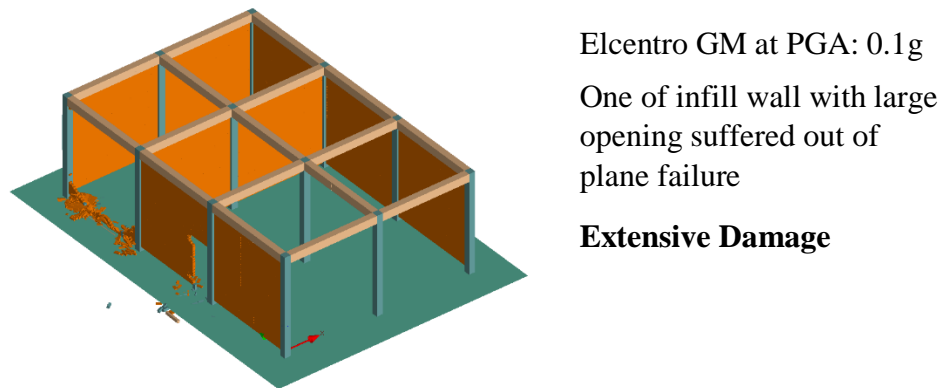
27. Damage Patterns and Damage Level at 0.1g of Elcentro ground motion for RC building Type D 1 storey
